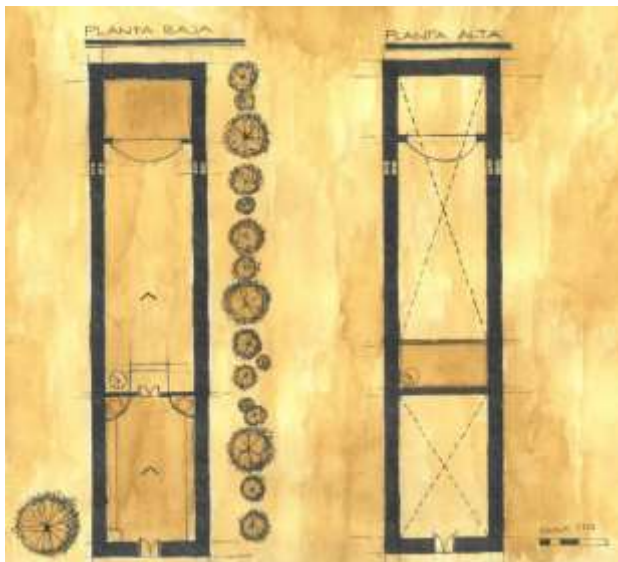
Architectural floor plans of a chapel as a representation of religious architecture in Huichapan, Hidalgo
